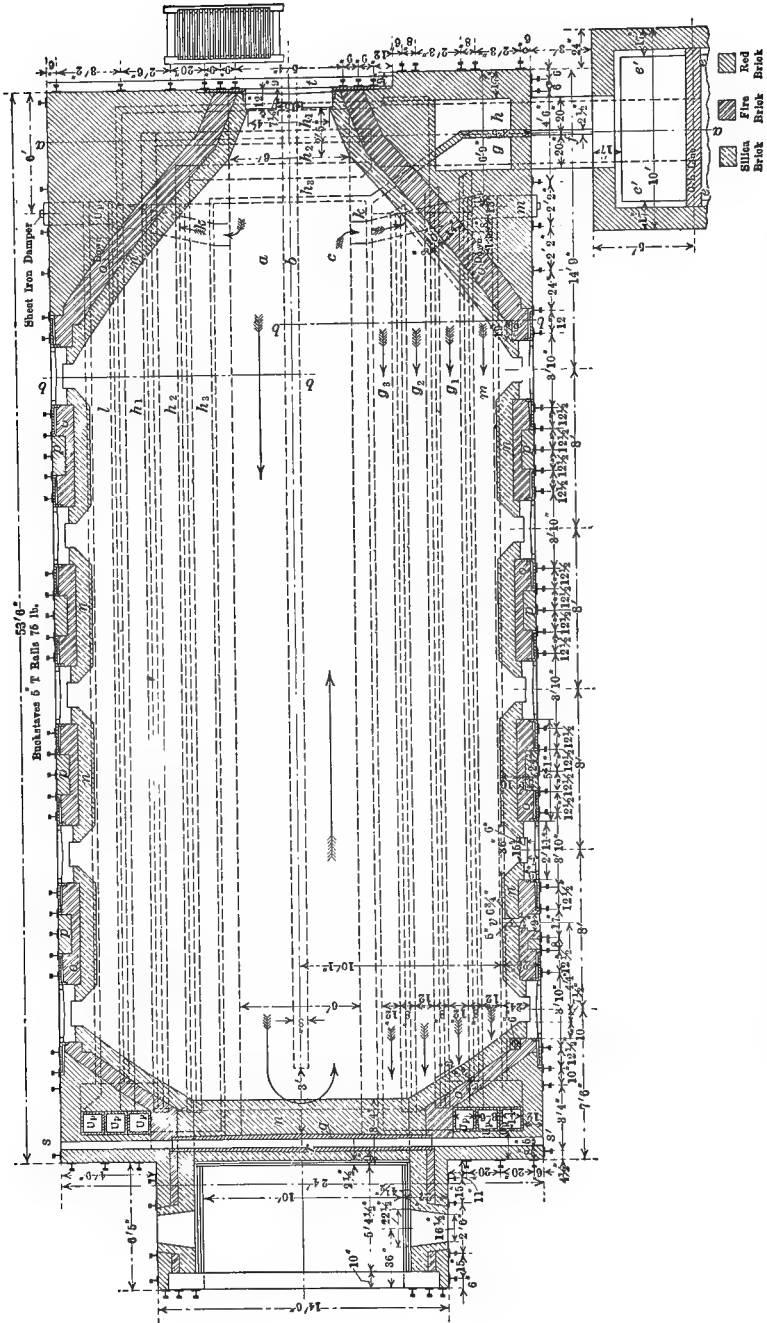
Reverberatory matting furnace Colorado Smelting Co., ground plan.
